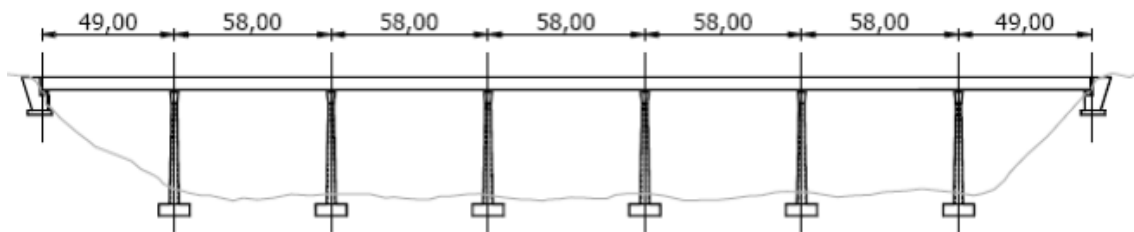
Longitudinal section for the bridge. Source: (P. Martins & Z. Sampaio, 2011)
